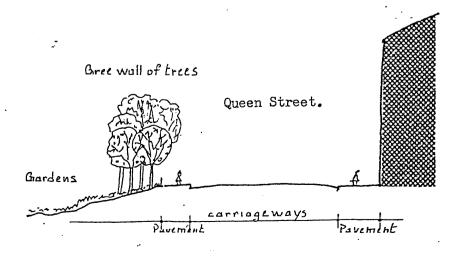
Cross-Sections of the main streets. scale I/5,00.
